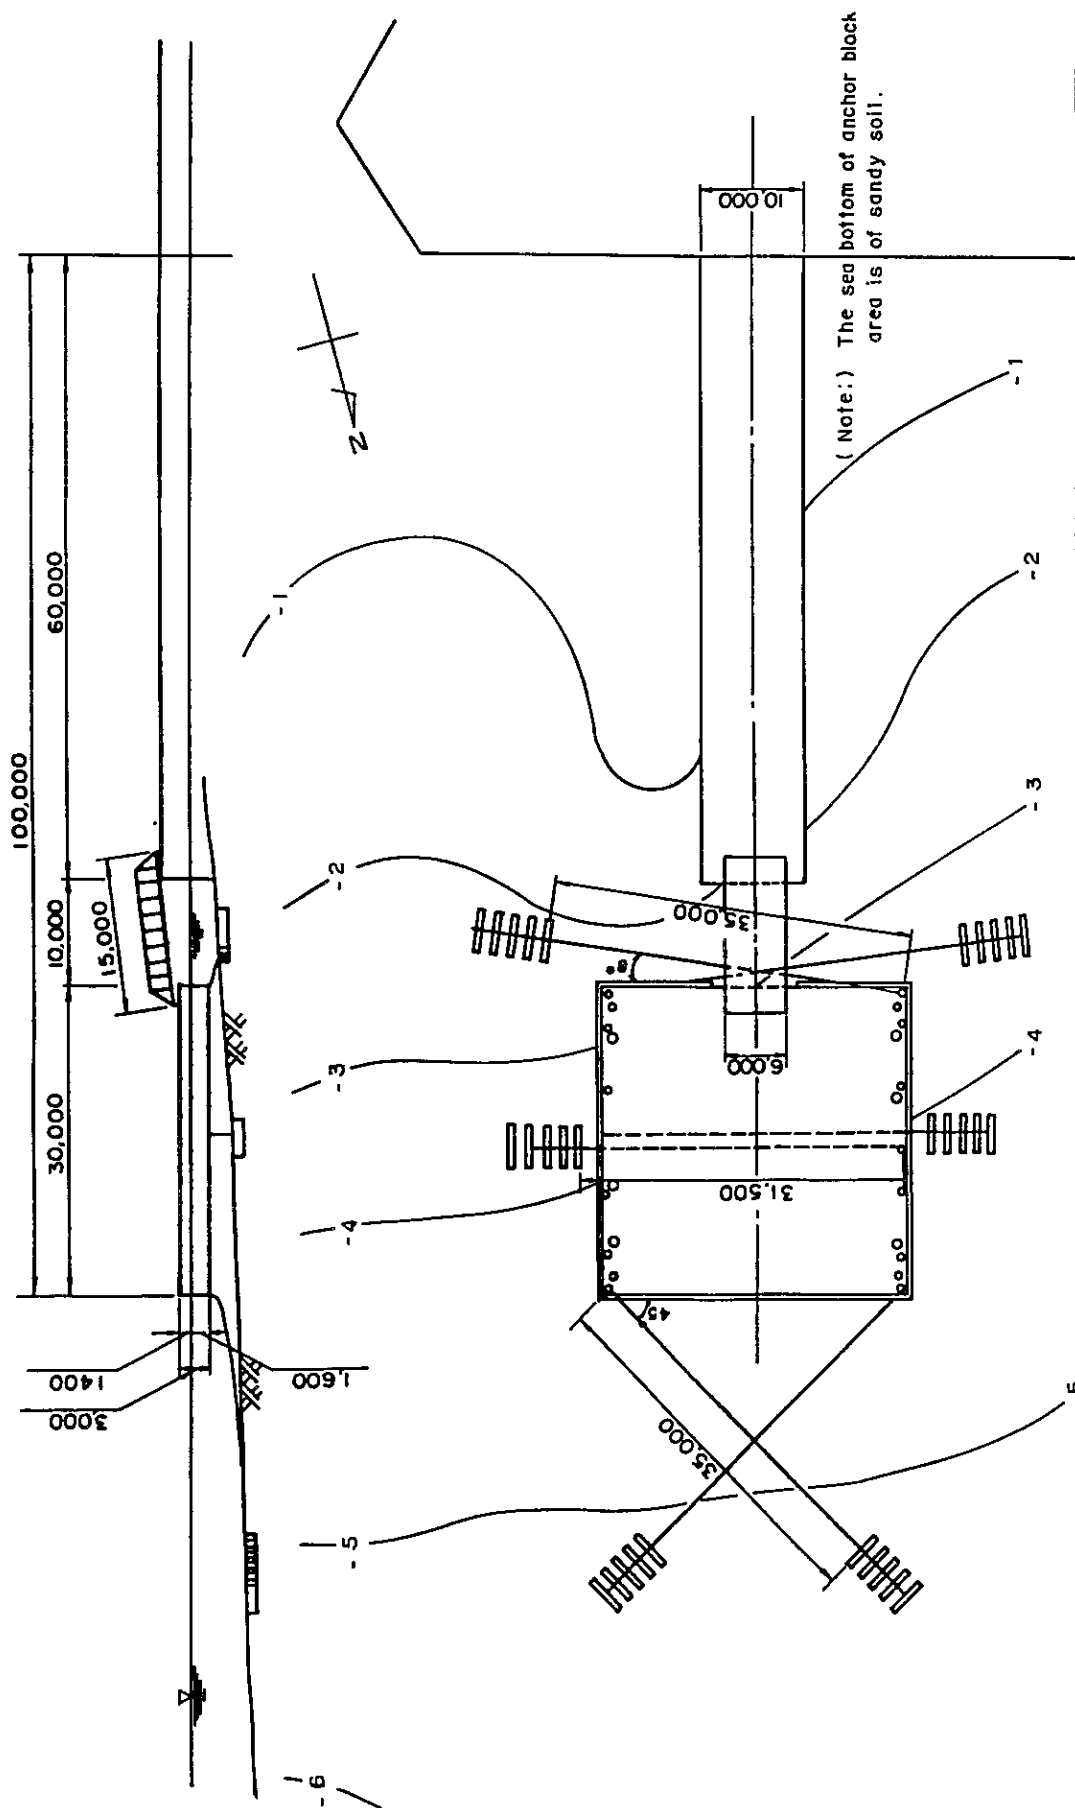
Mooring Arrangement of Berthing Facilities
